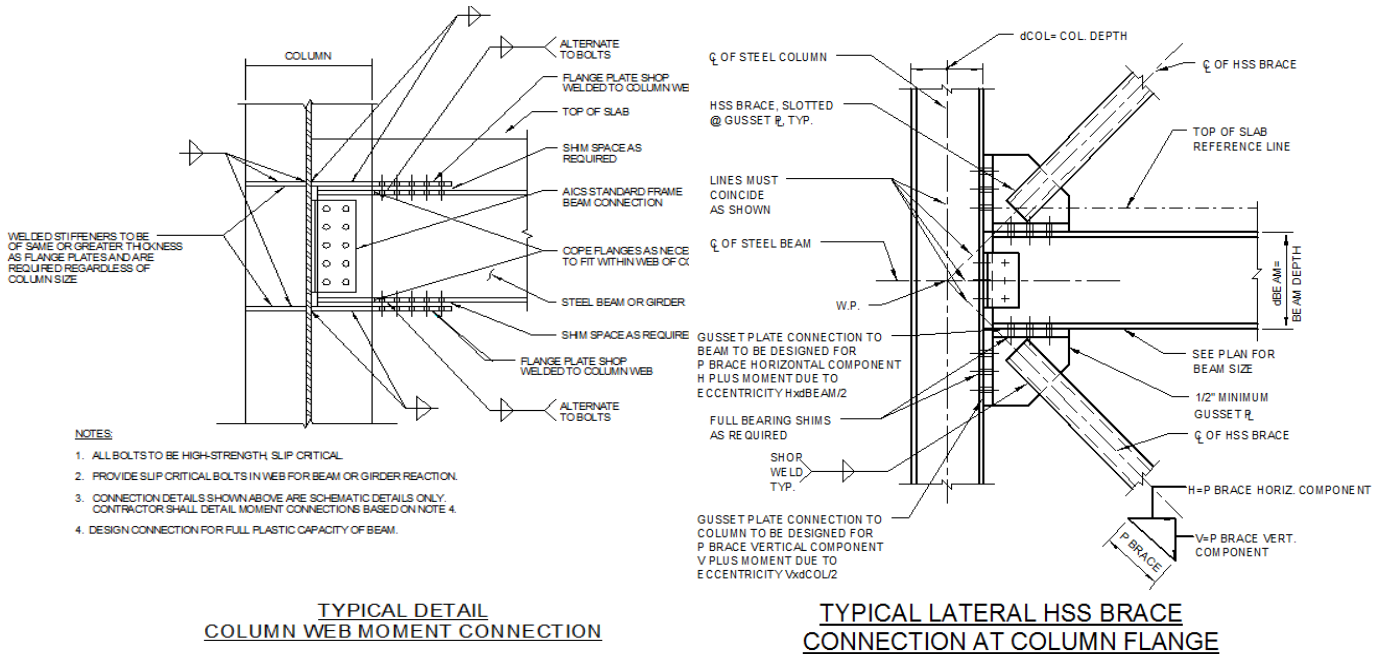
TYPICAL COLUMN WEB MOMENT CONNECTION (LEFT). TYPICAL LATERAL HSS BRACE CONNECTION (RIGHT). DRAWINGS ARE NOT TO SCALE. DETAILS COURTESY OF TURNER CONSTRUCTION.
